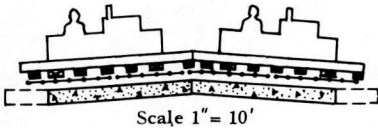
Cross-section showing positions of paving machine passing over fabric.
